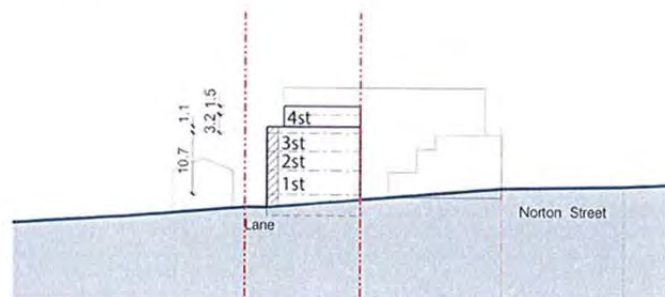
Carlisle Street - Building envelope - Street Elevation A-A
